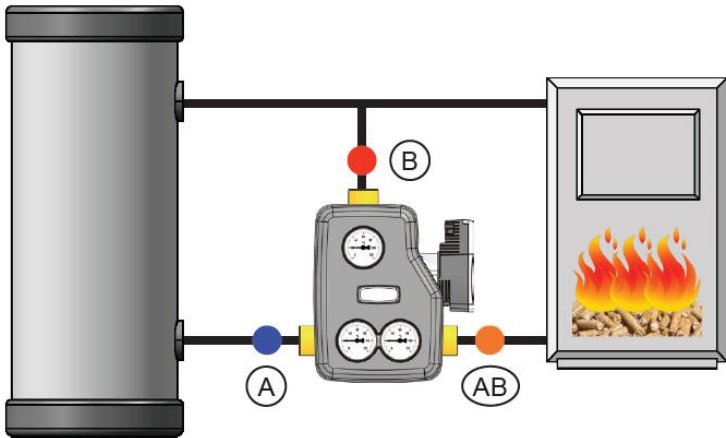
Installation of the RTA heating pump assembly in a system with a solid fuel boiler on the right-hand side.
